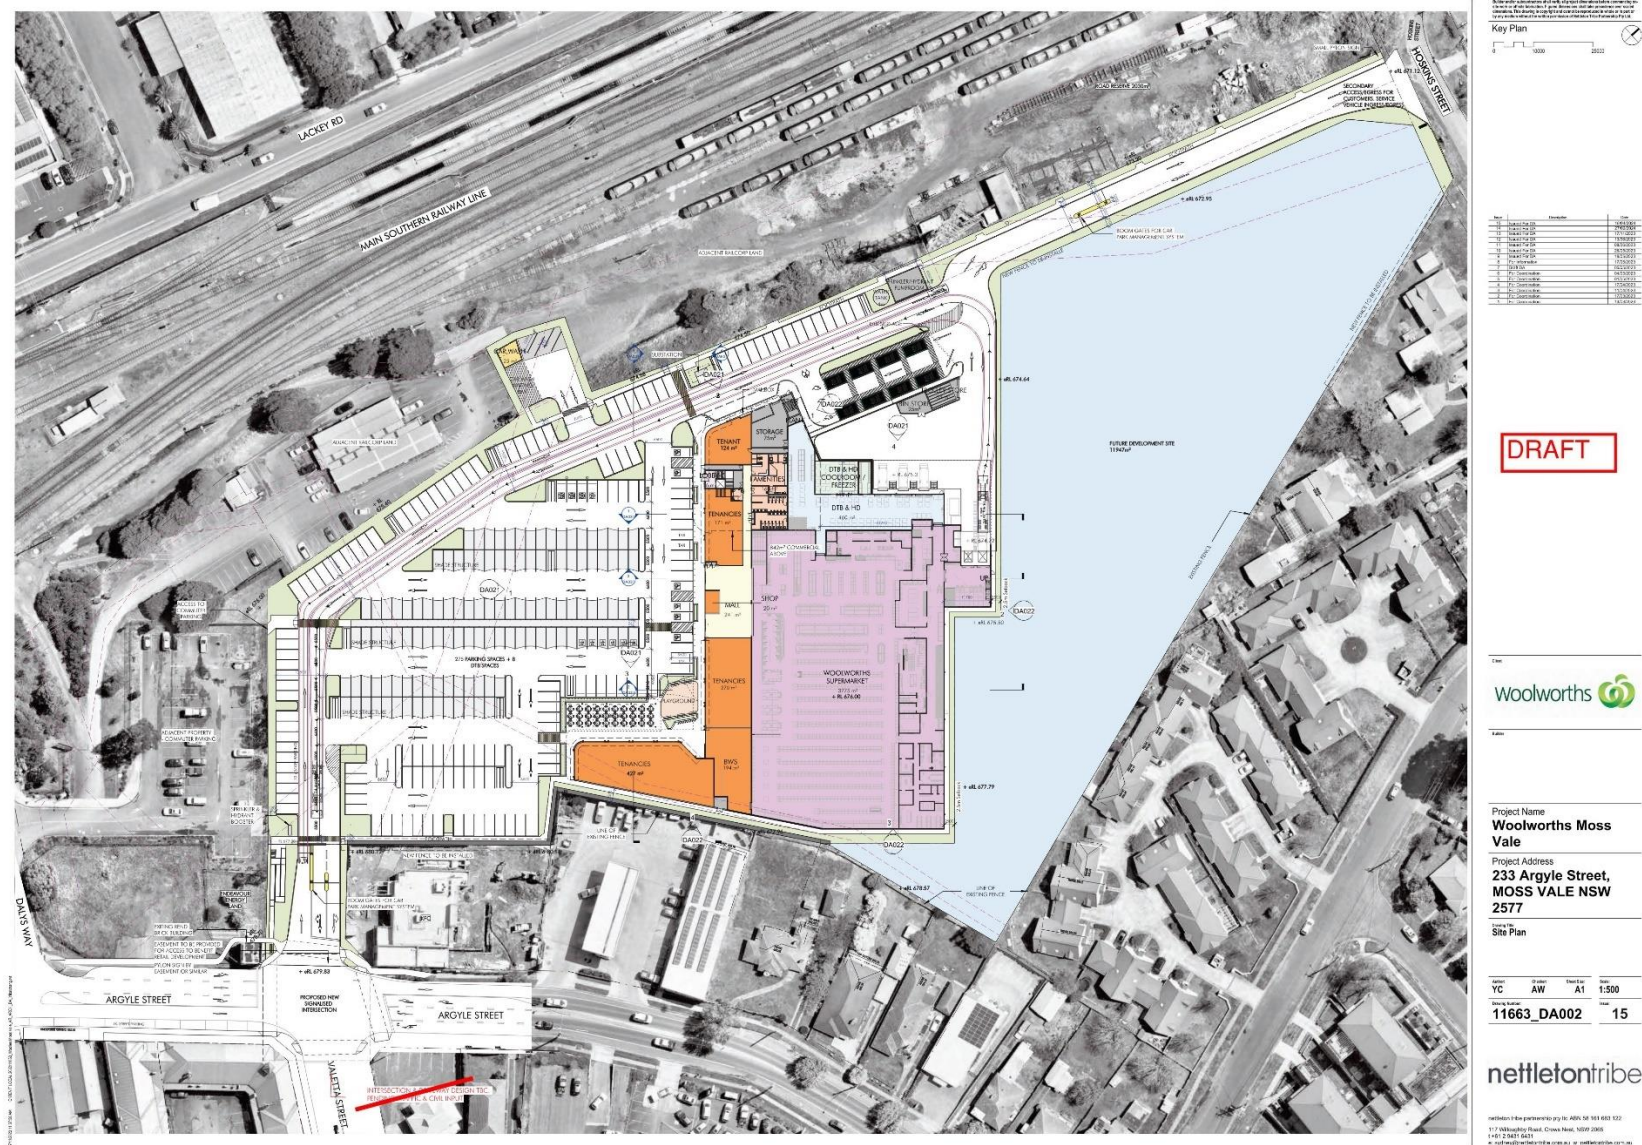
Aerial Site Plan with Proposed Loading Dock
